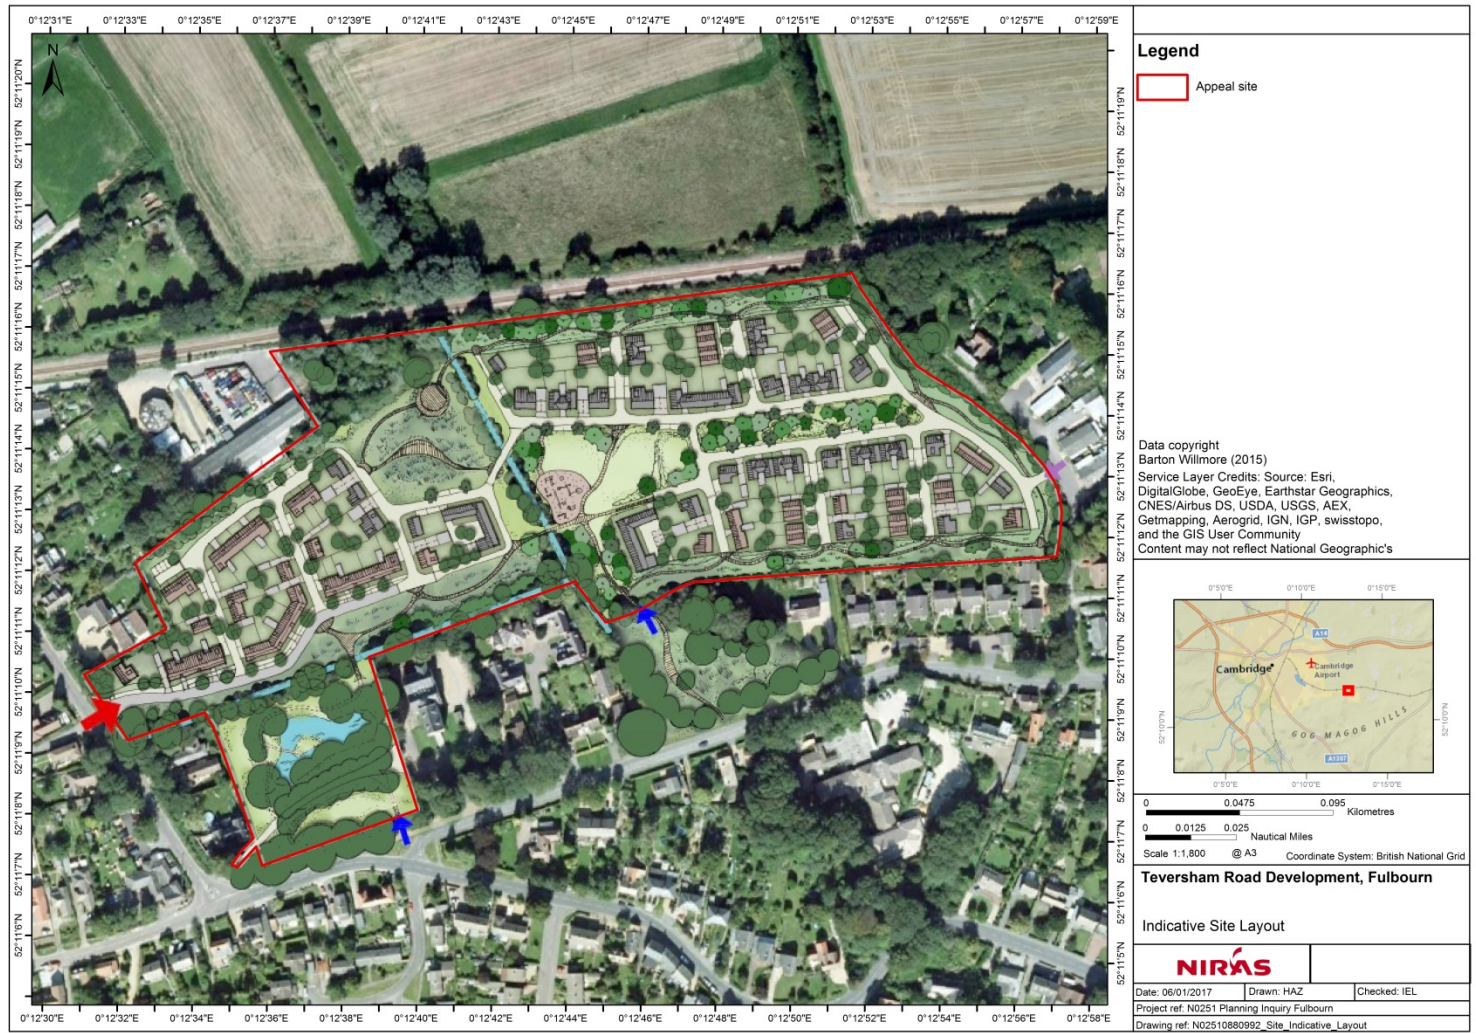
Indicative layout of the proposed development at Land at Teversham Road, Fulbourn.
